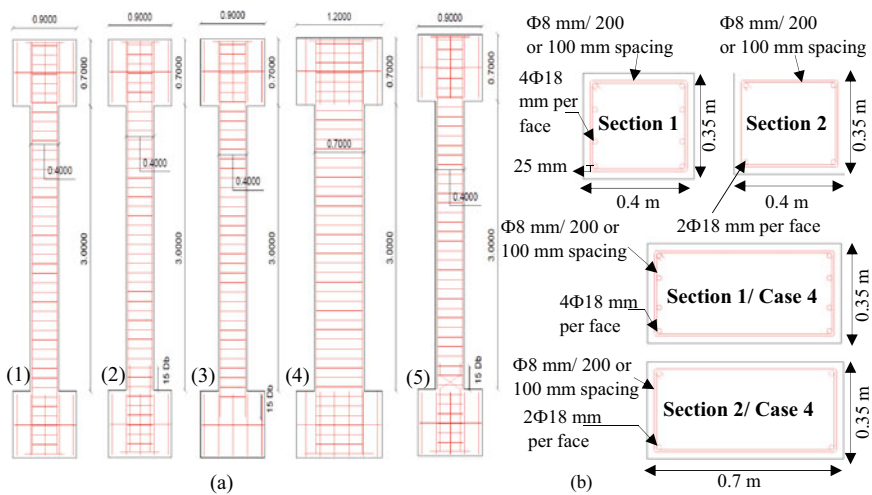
a Column cases and detailing (all dimensions are in m). b Section geometry
